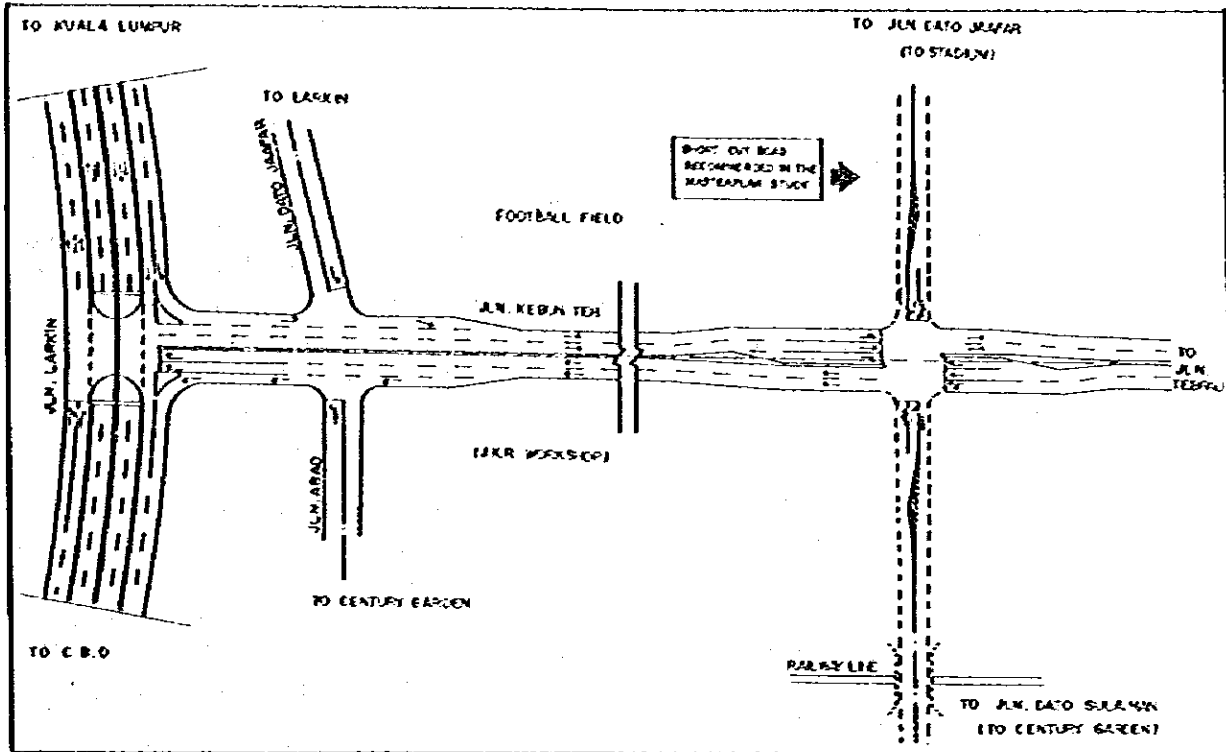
INTERSECTION IMPROVEMENT PLAN AT THE INTERSECTIONS OF JLN KEBUN TEH WITH JLN LARKIN AND JLN ABAD (PLAN 'A')
